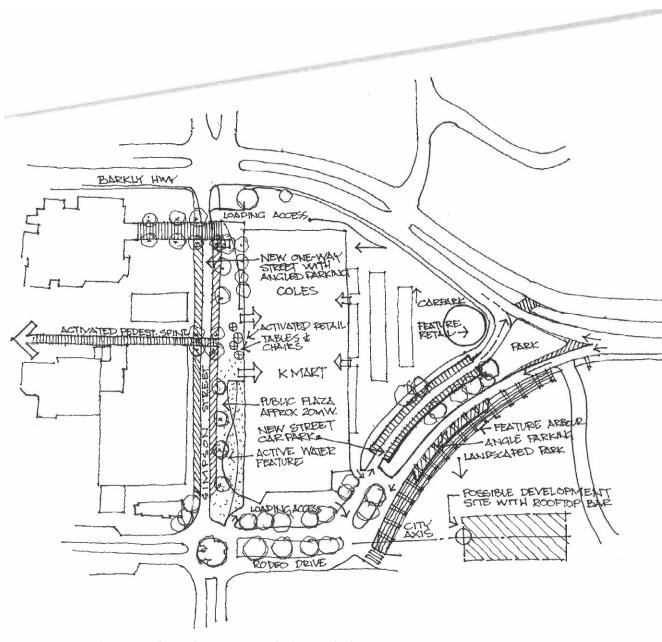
Proposed Mount Isa Village and Simpson Street Redevelopment Sketch
